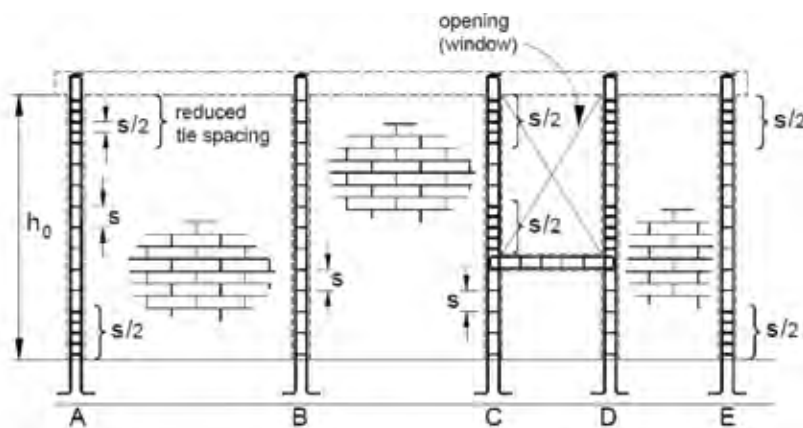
Tie-column reinforcement details- reduced tie spacing requirements at ends (S.Braze 2011)
